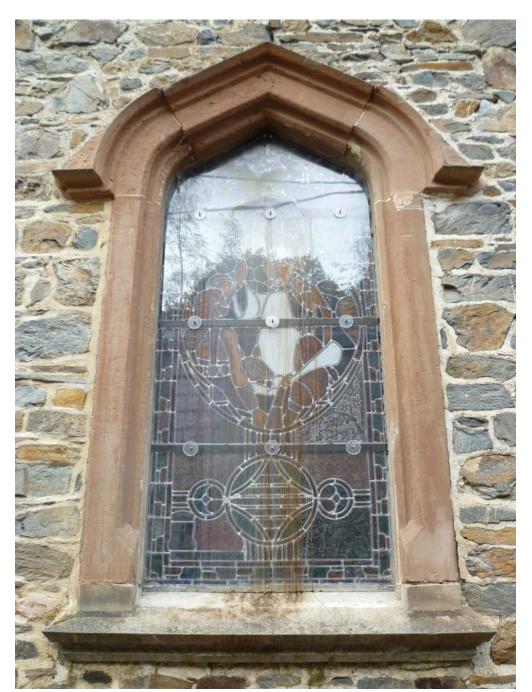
Insects such as wasps and spiders have been observed to nest in unventilated spaces between stained glass and protective sheeting (the cause of the staining shown here), but there may be some evidence that flying insects are discouraged by the airflow in the EPG interspace. This remains highly uncertain, however. For important stained glass, the ability to demount the glazing quickly in an emergency can be one crucial advantage of a framed EPG system, but care does need to be taken with the design in certain sites, to ensure the risk of theft is not increased. Theft risk can be further reduced by using security screws and fixings.
